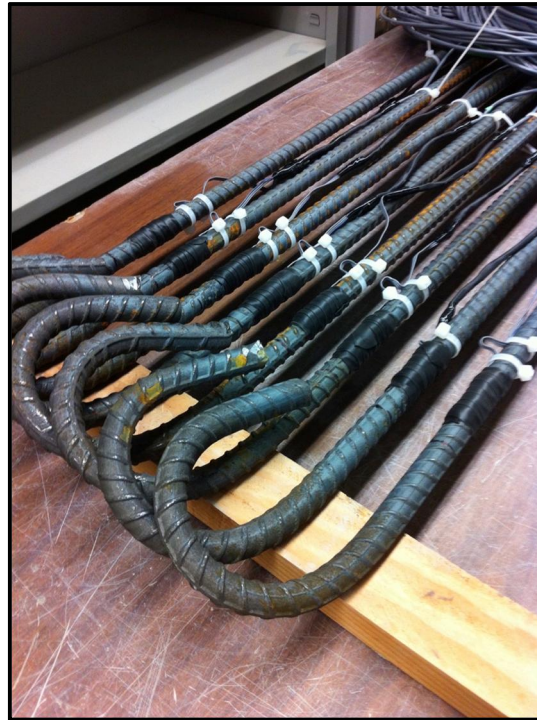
Hooked Bars With Instrumentation (Typical)
